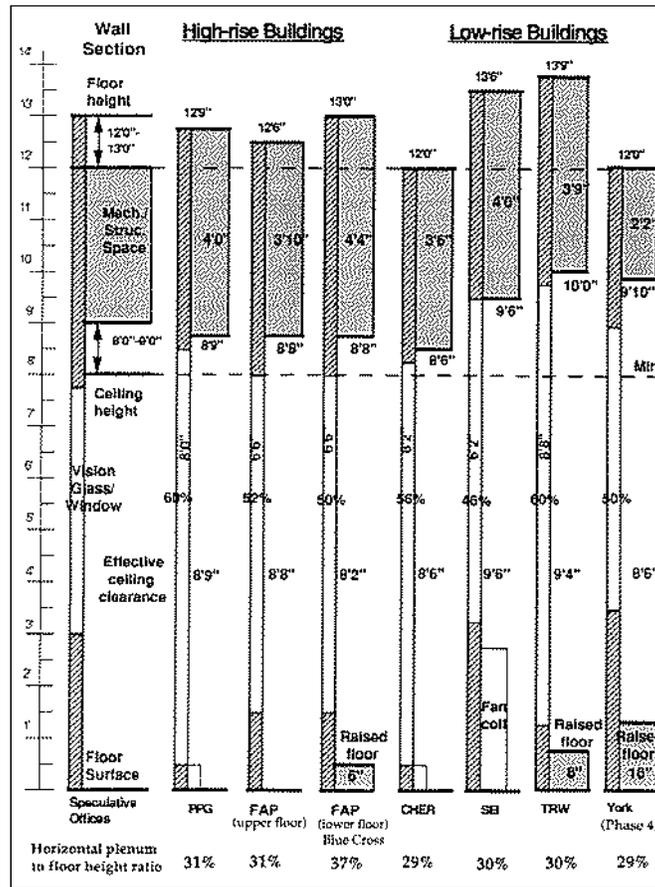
Effect of a raised floor on building floor-to-floor height (Chiu, 1991).
